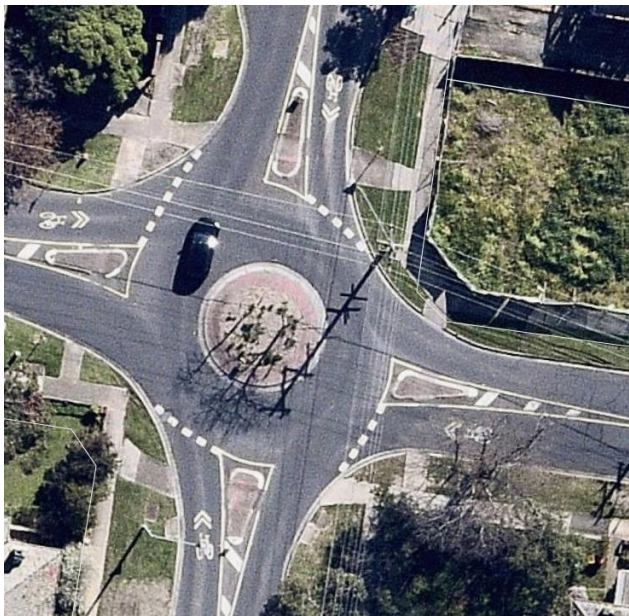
EXAMPLE OF SHARROWS AT A ROUNDABOUT
